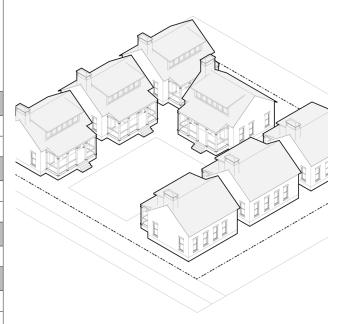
N: Examples of COTTAGE COURT Buildings:
